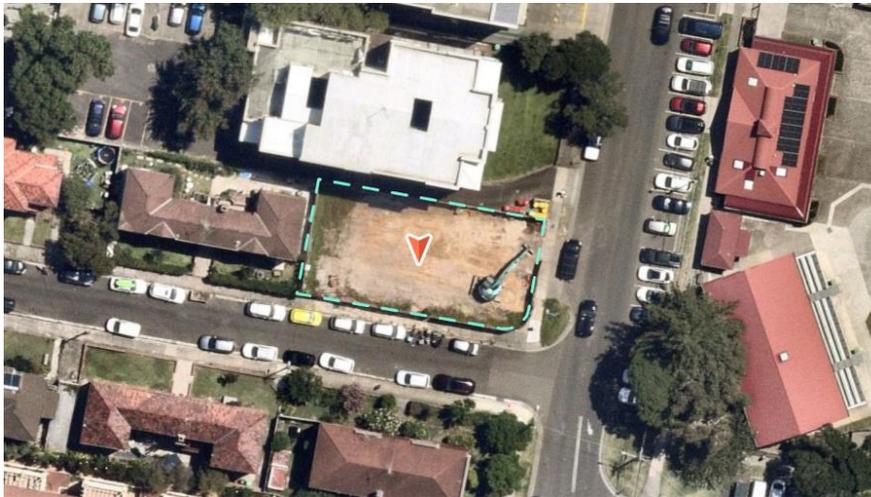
Aerial photograph of the subject site in January 2025 (Source: Nearmap)
